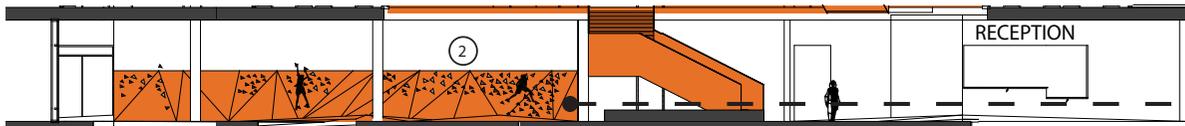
Section through atrium view of area 2 (interior climbing wall). Scale 1:300
